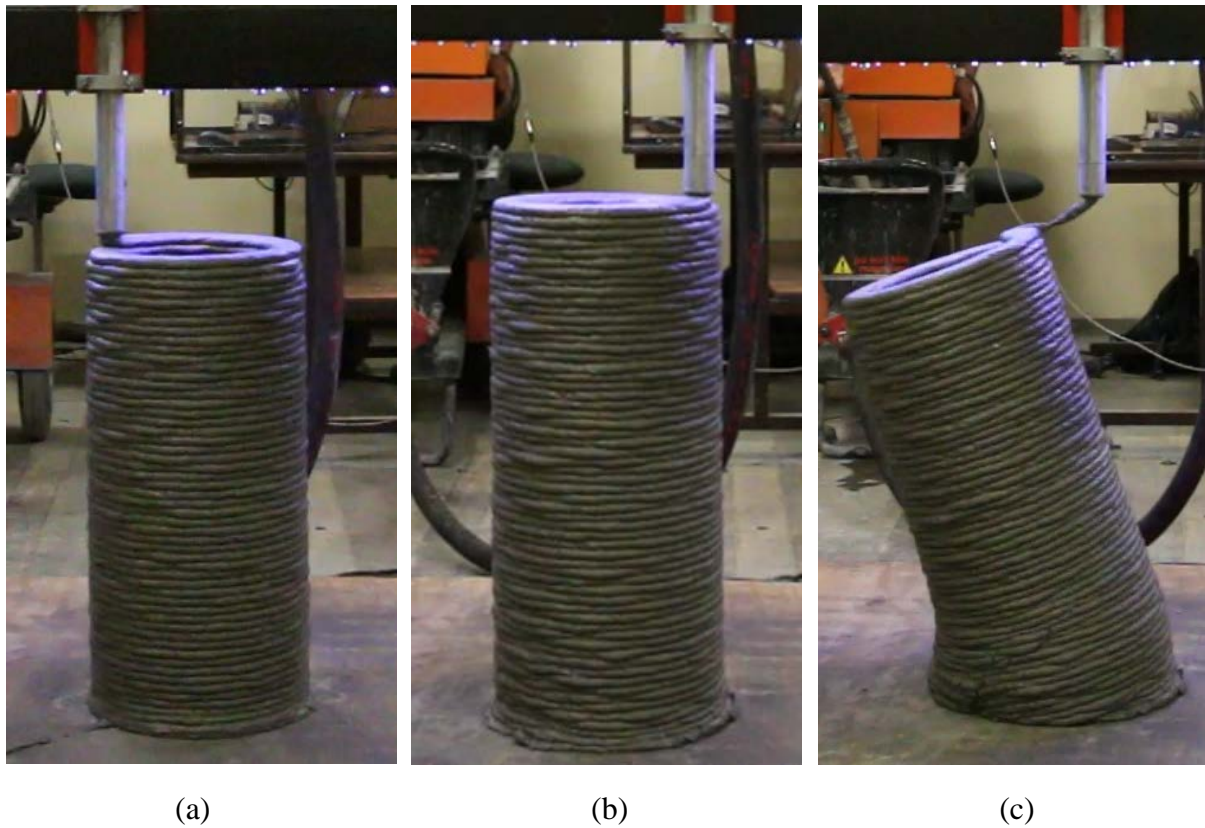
3D printed circular hollow column with: (a) standard concrete mix; (b) 1% nS concrete mix; (c) typical instability that resulted in failure.
